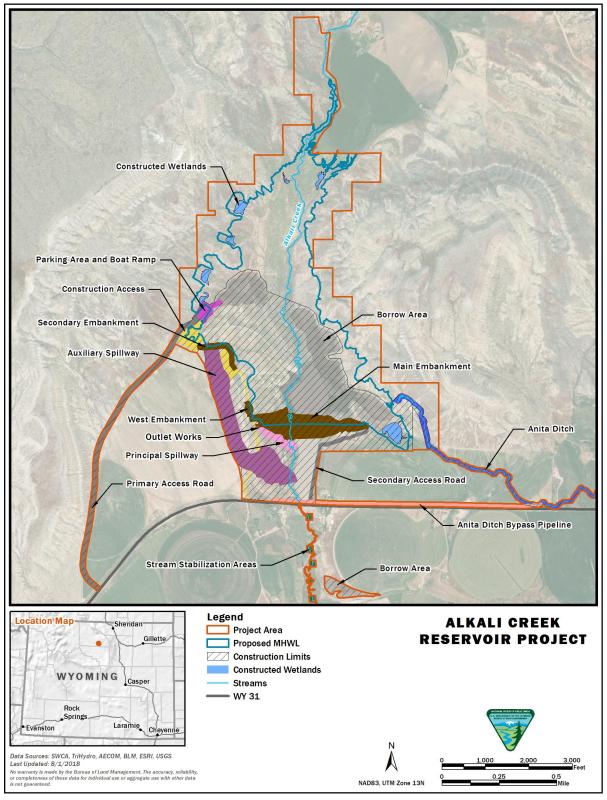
Proposed Action showing the project area and project elements, west side.
